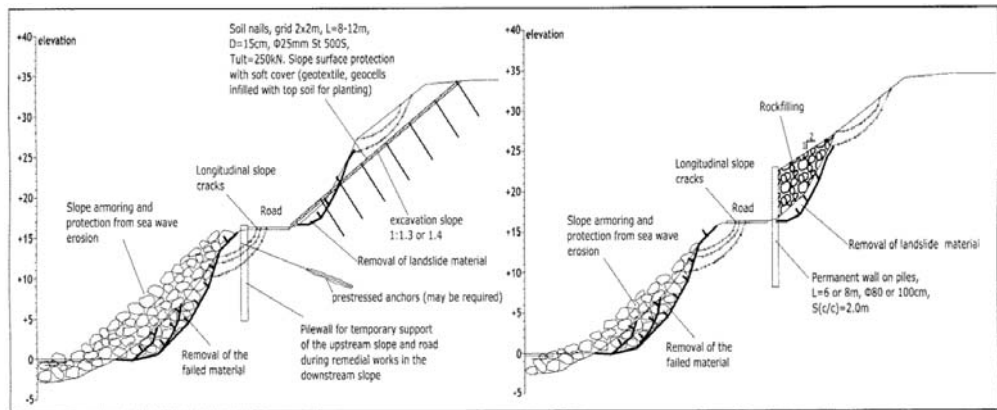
Schematic reconstruction of solutions A (left) and B (right)
